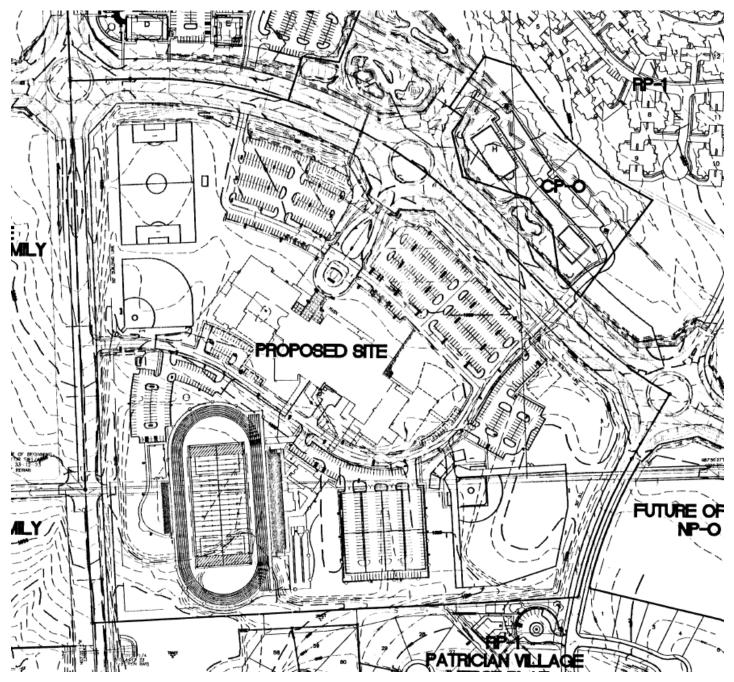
Previously approved preliminary plan (PL09-01PR).
